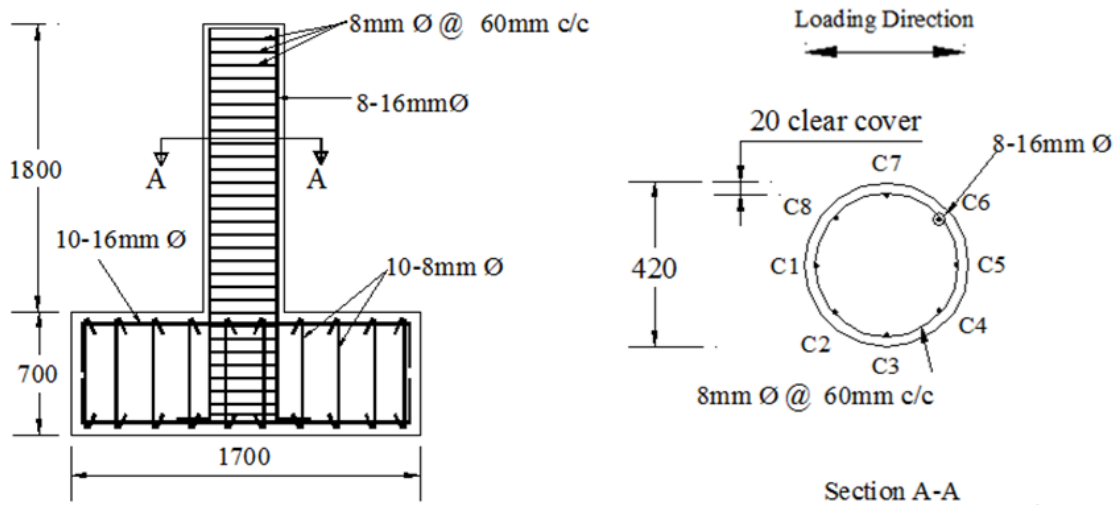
Reinforcement details of scaled model of prototype bridge pier (Kotoky *et al.* 2018)
